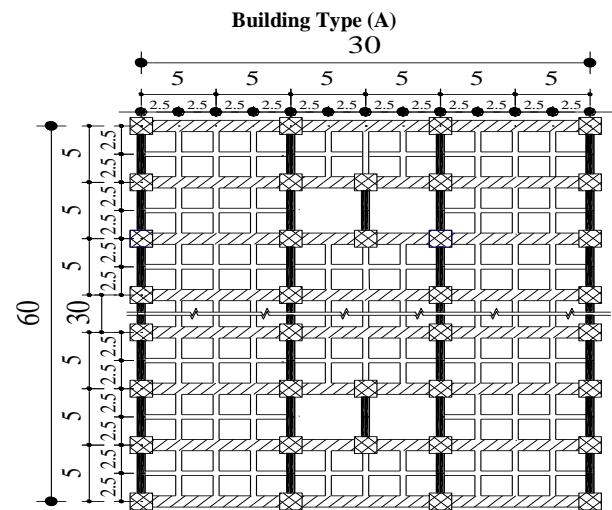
Floor Plan of Building (All Dimensions are in M).
